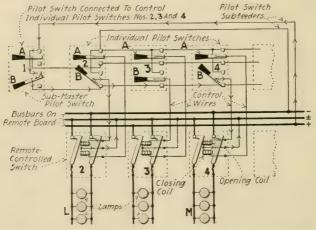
One pilot switch so connected as to control two or more other pilot switches. (The set-up and the indicated current-path is shown for extinguishing lamp-groups L and M.)
